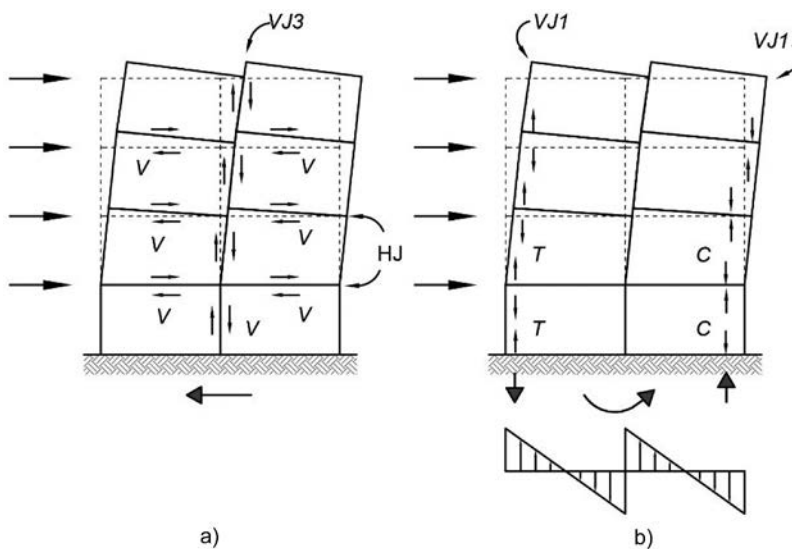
Prefabricated RC shear wall subjected to in-plane seismic loading: a) shear forces and b) tensile and compressive forces (based on FIB 2008).
